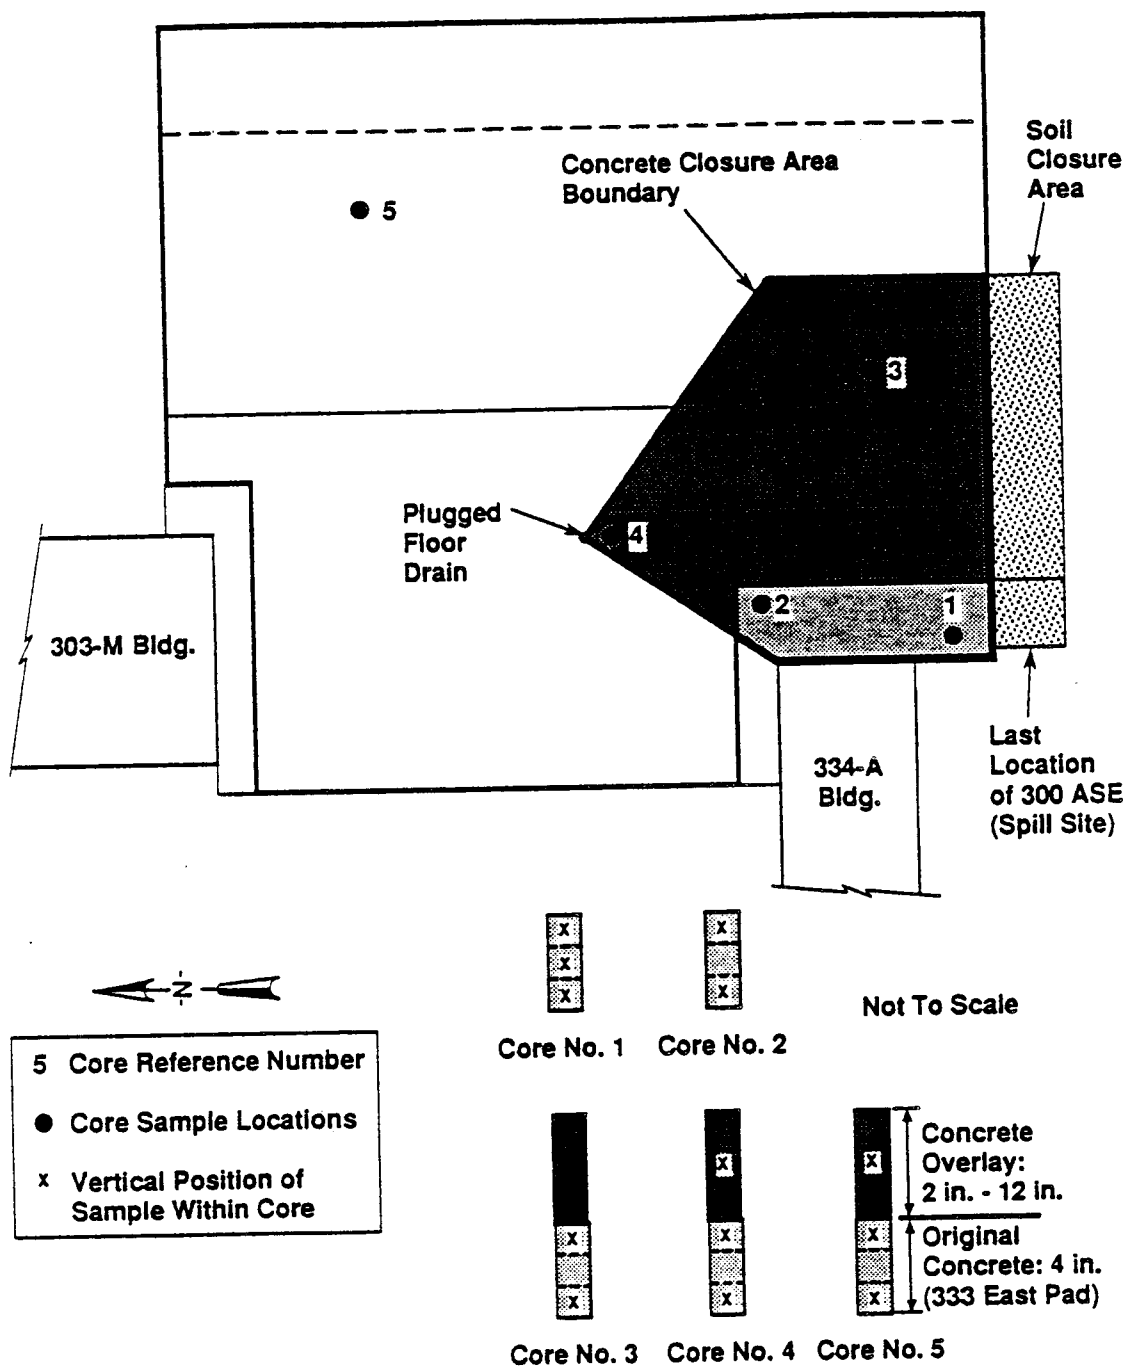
Concrete Closure Area, Sampling Sites, and Sample Locations.
